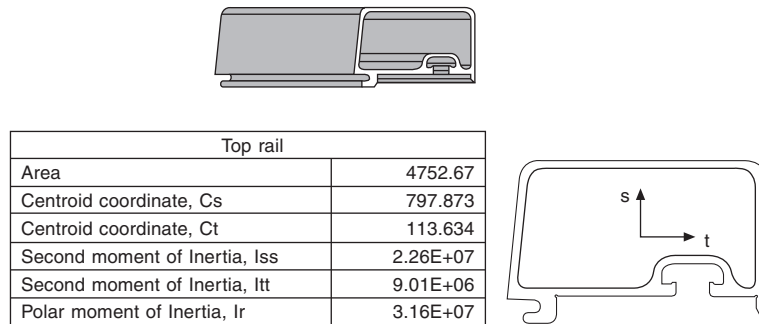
Three-dimensional model, cross-section view and inertial properties of the aluminum bridge parapet top rail.
